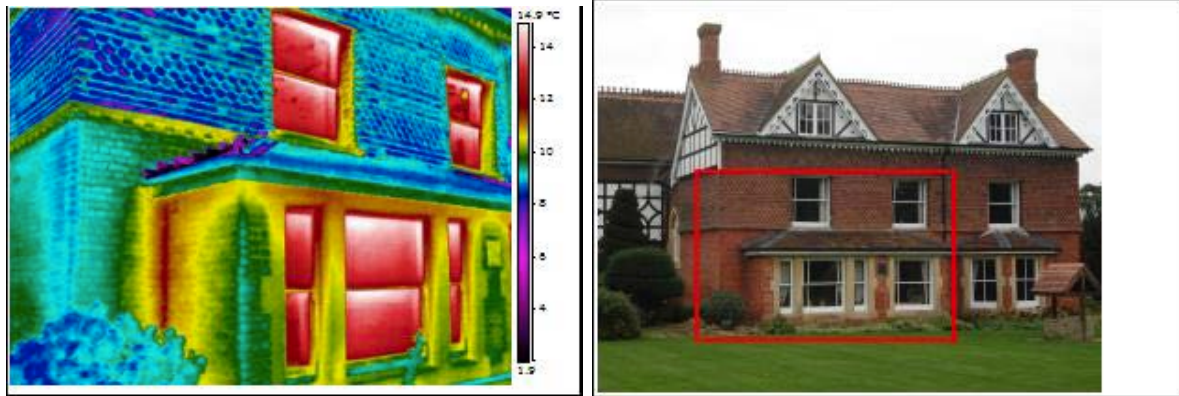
Southwest elevation. The image shows significant heat loss through windows and heat loss through the wall junction.
